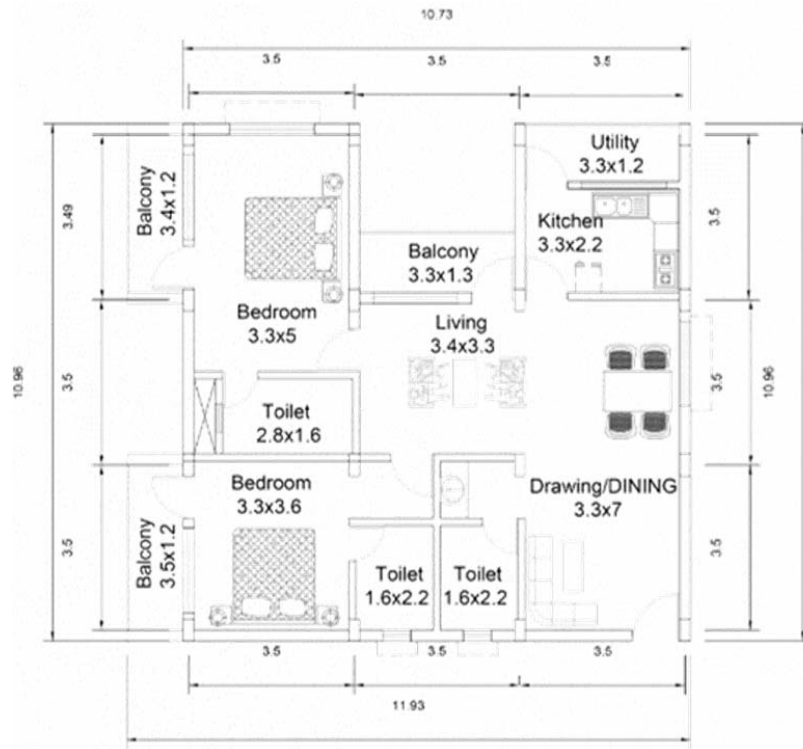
Typical floor plan of 2 BHK (1 unit)
